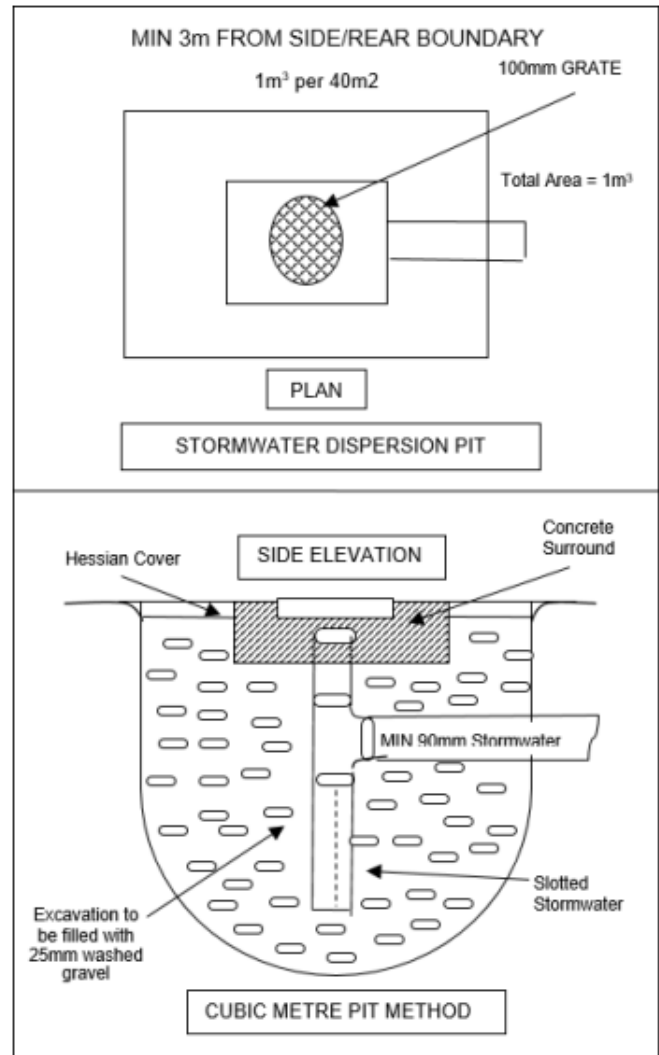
Rubble Pit - One (1) Cubic Metre Pit Method per Downpipe
